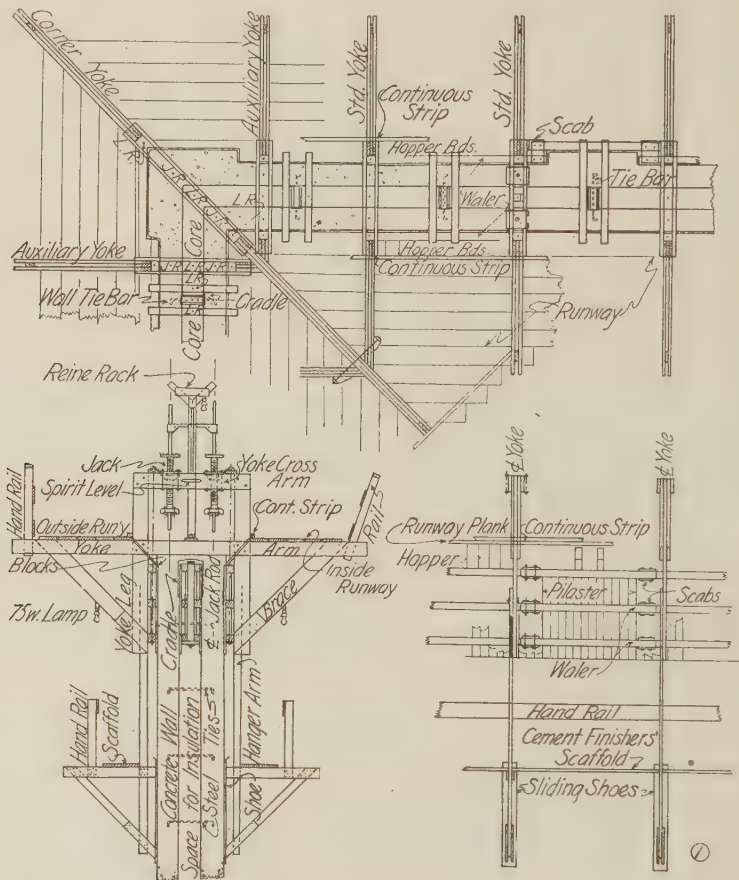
GENERAL FORM LAYOUT FOR STANDARD METHOD, DOUBLE WALL SLIDING FORMS
